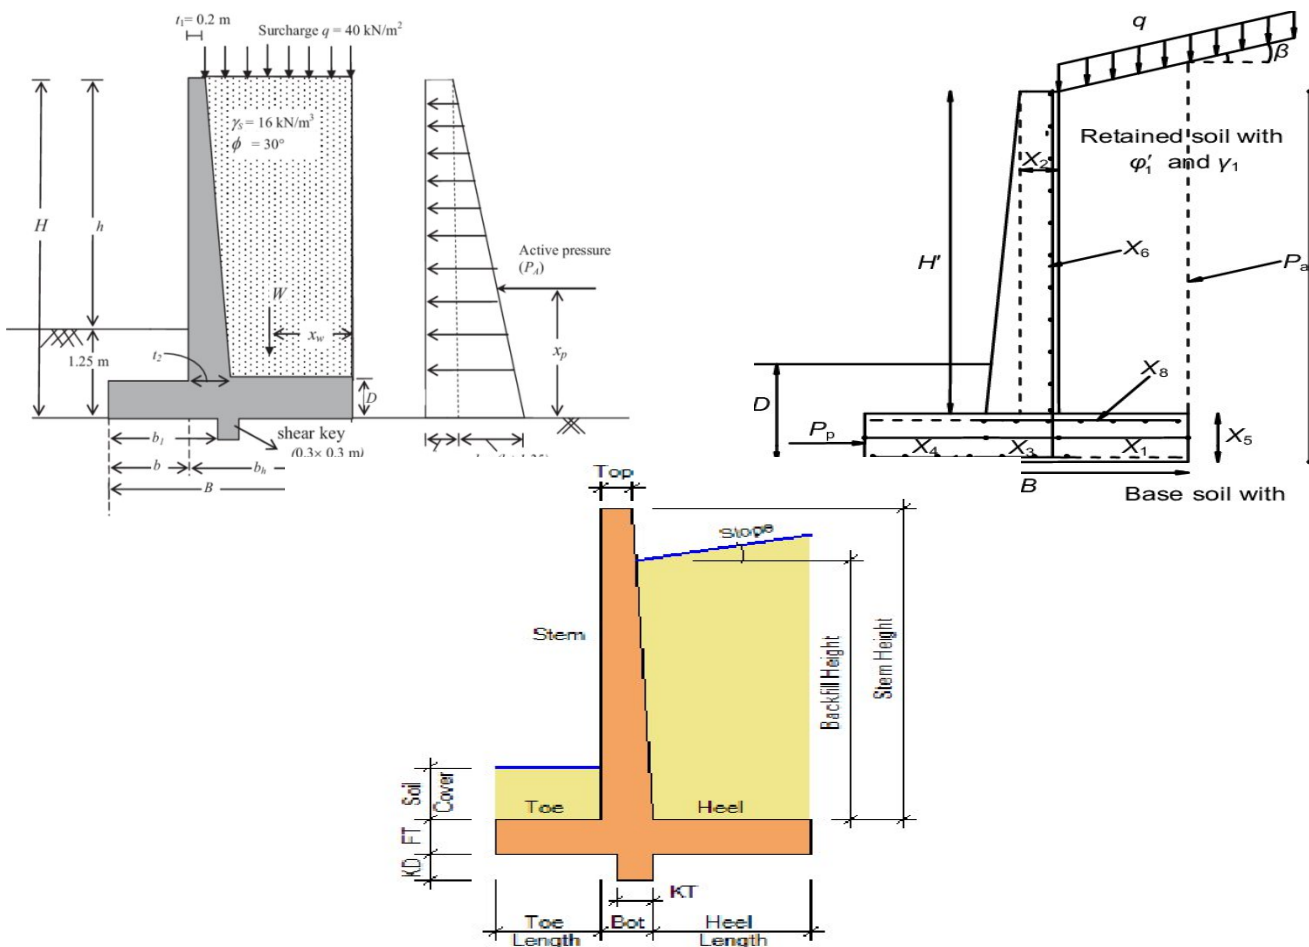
Typical Section of Cantilever Retaining Wall
